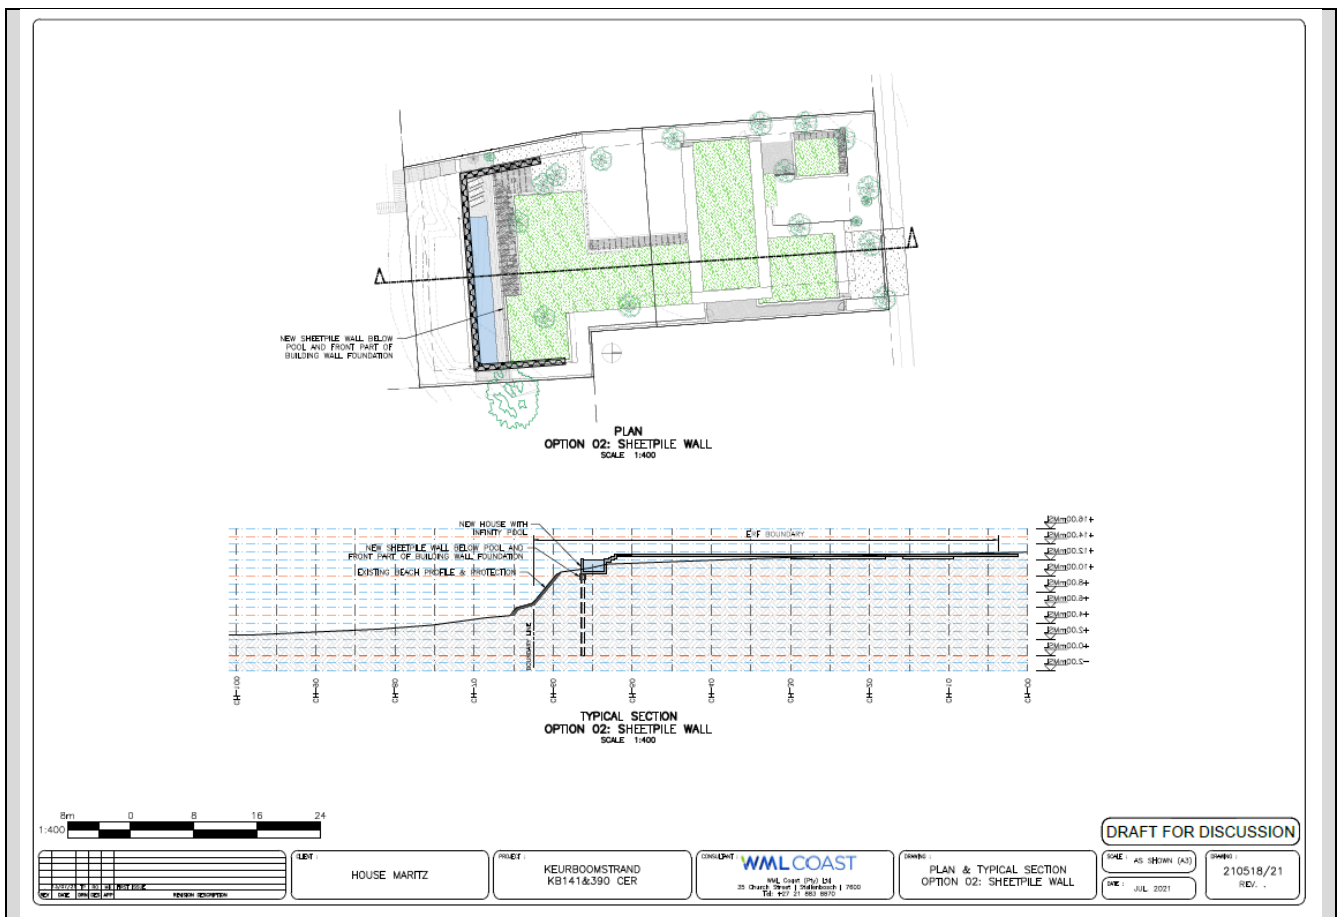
Alternative 2-OPTION 02: SHEETPILE WALL
